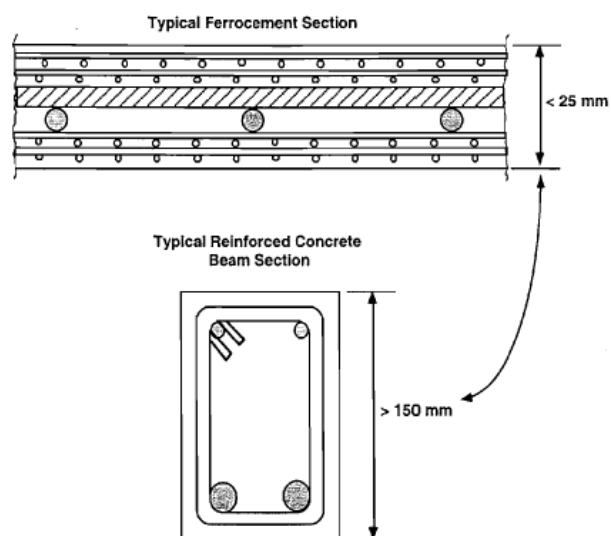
typical cross section of reinforced concrete against ferro cement. [6]
